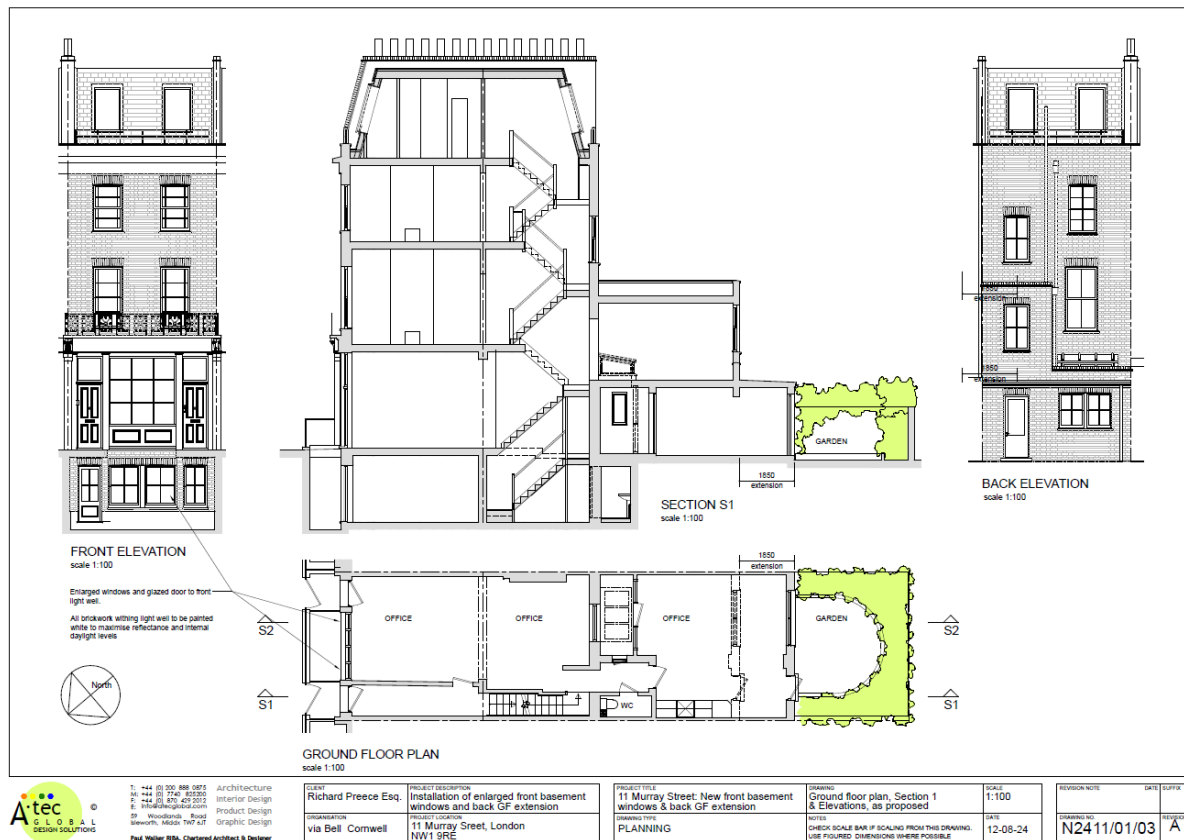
Proposed floor plans, elevations and sections (Source: submitted drawings)
